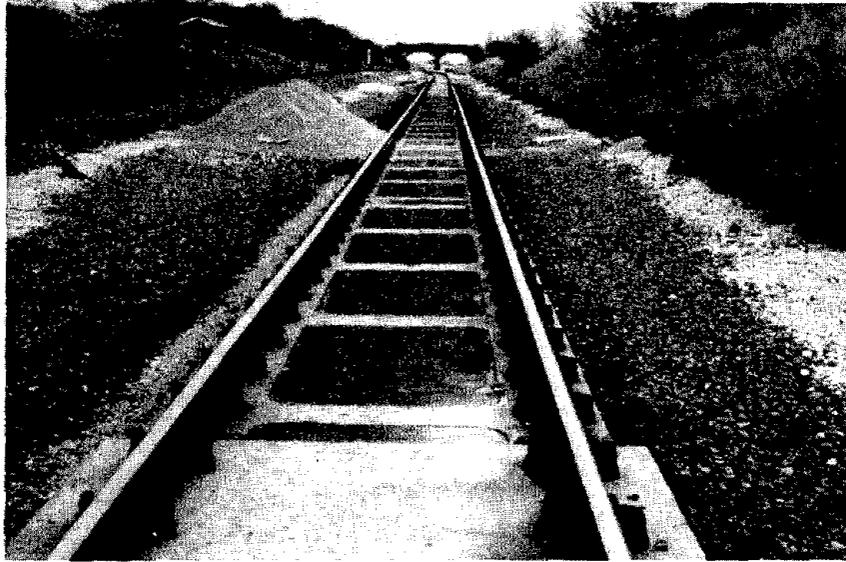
PRECAST CONCRETE LADDER UNITS AT
